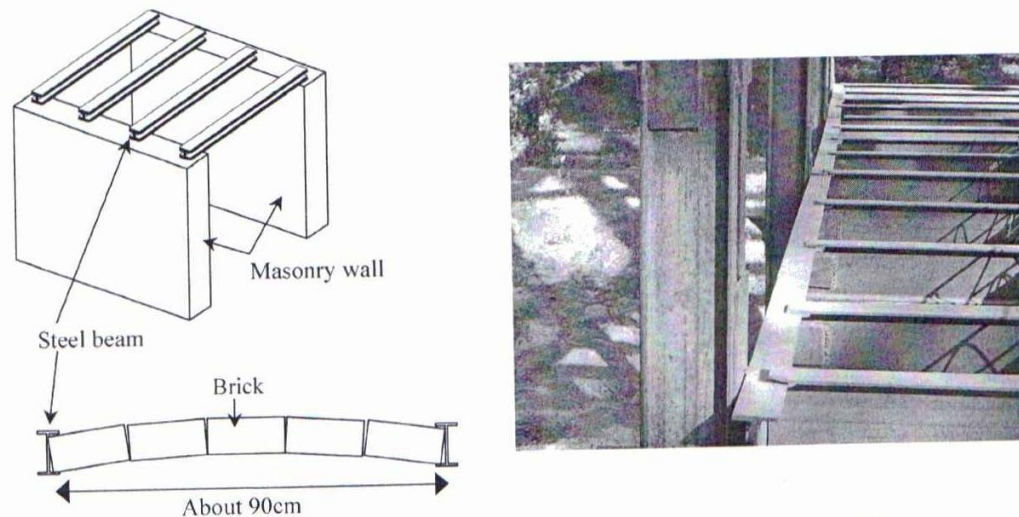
Commonly used jack arch slab in Tehran (left: wall supporting, right: girder supporting) (Sanada et al., 2005:97)
